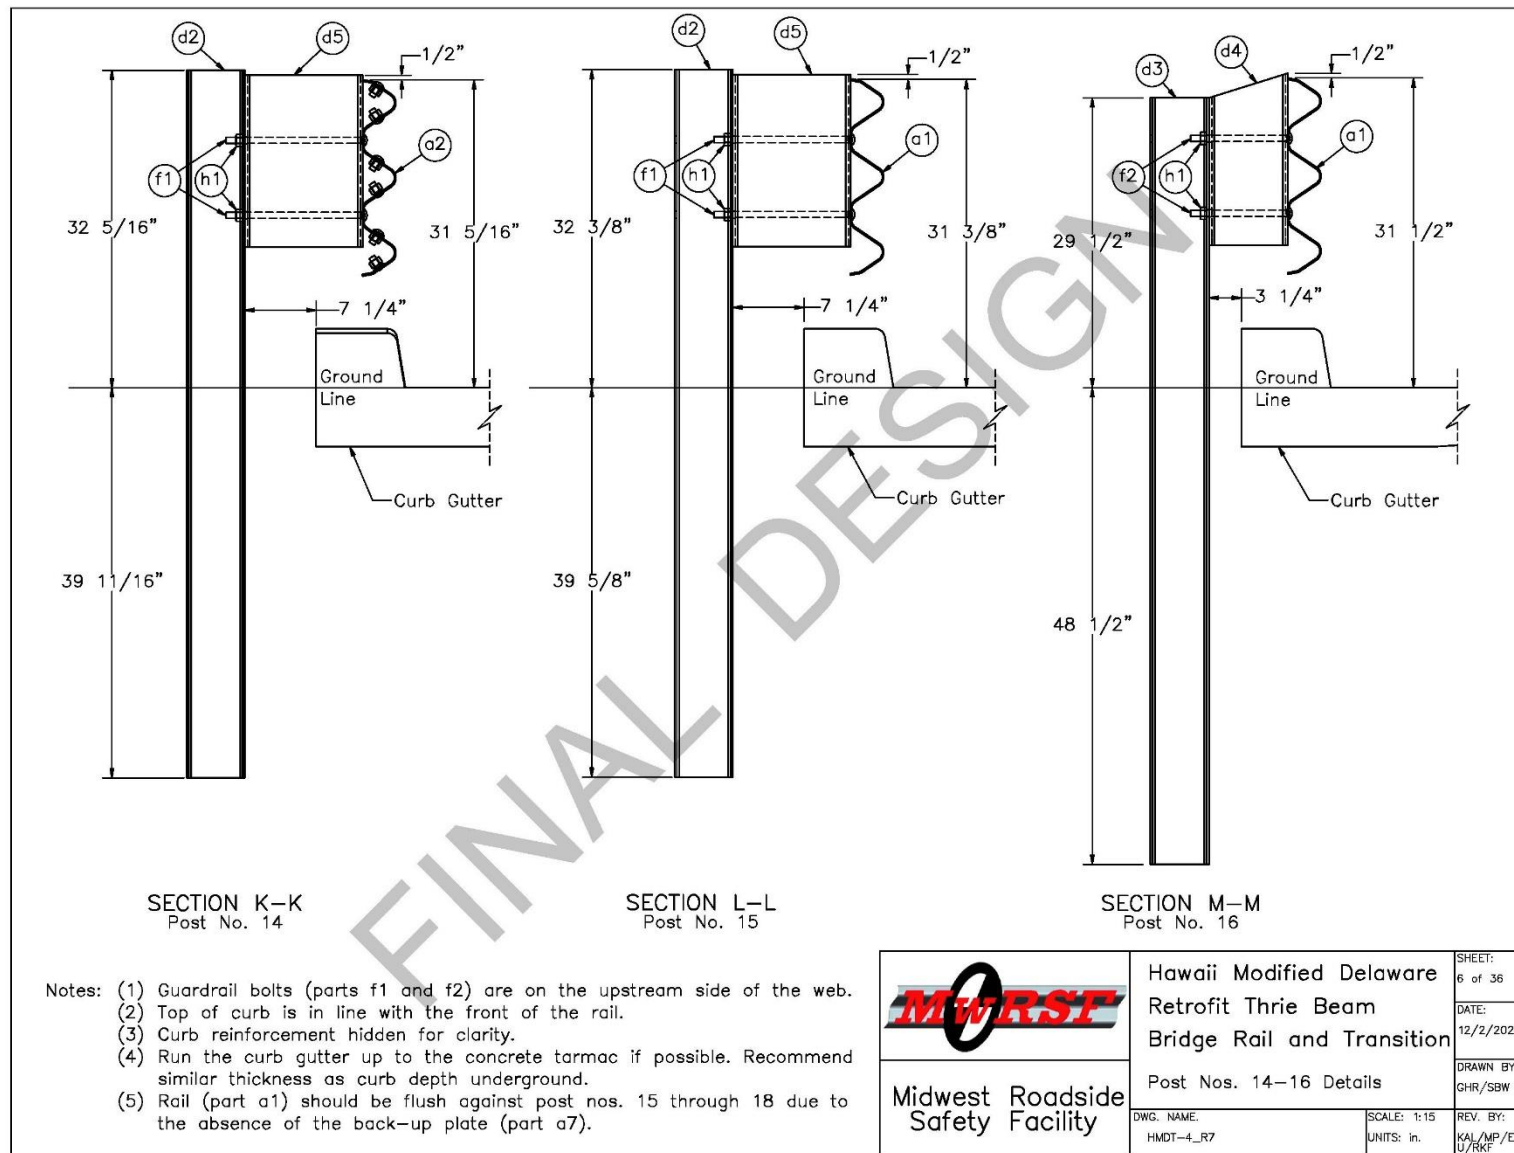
Post Nos. 14 through 16 Details, Test No. HMDT-4
